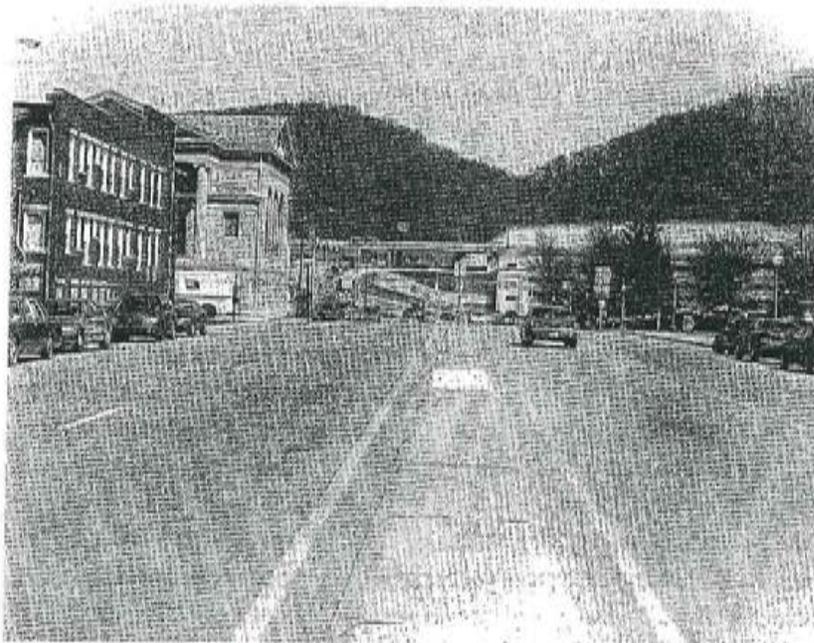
Divided Arterial Street With Parking Lanes
